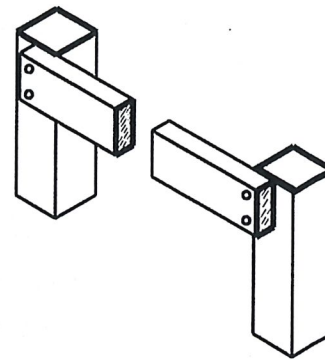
Exterior Connection: Top/Bottom Rail Skew Nailed to Post - 63 mm (2½") NailsNotes:
